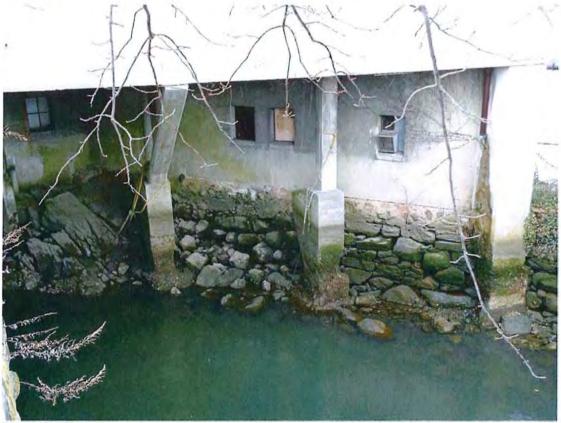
Western bank stone retaining wall located north of the US 1 bridge, underneath the Union Savings Bank building. View to the west.
